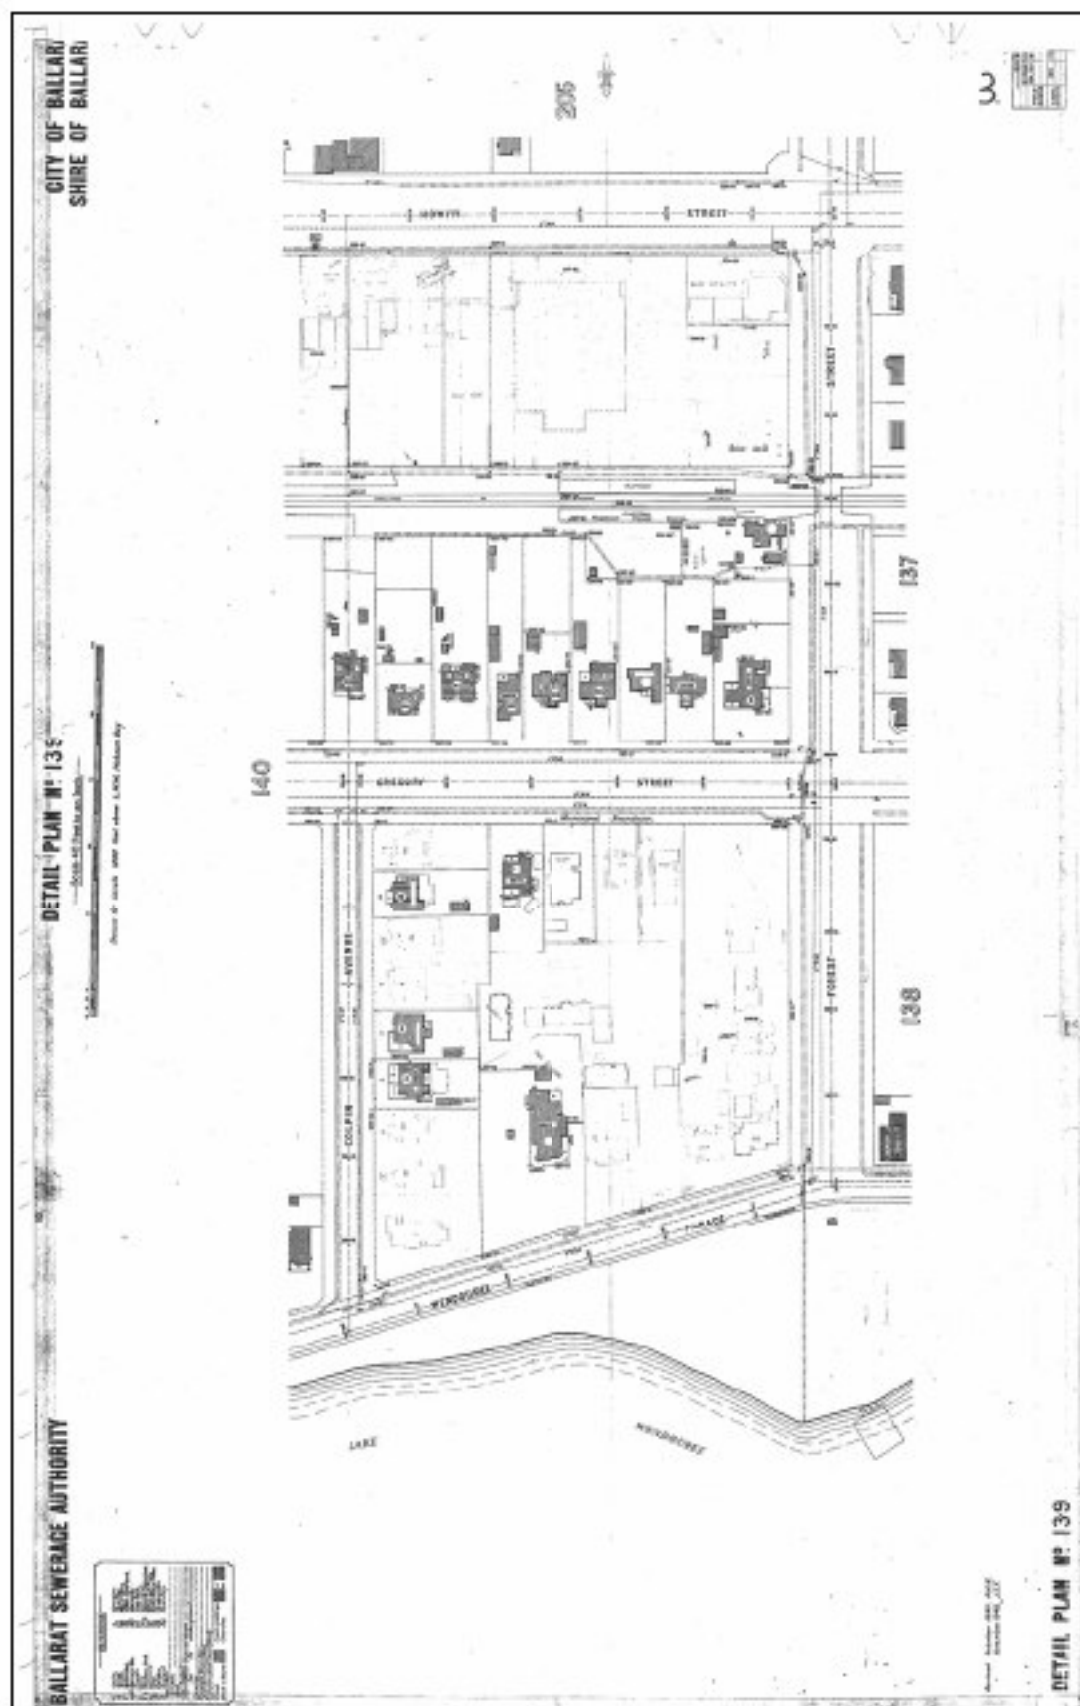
Ballarat Sewerage Authority Plan, 1948. Source: Planning Department, City of Ballarat.
